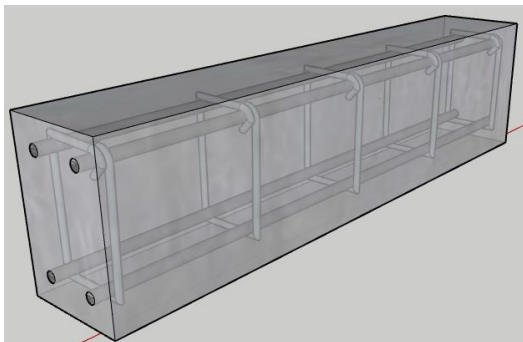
Normal Beam with Main Reinforcement 4Ø12 and Stirrup Ø6-150
